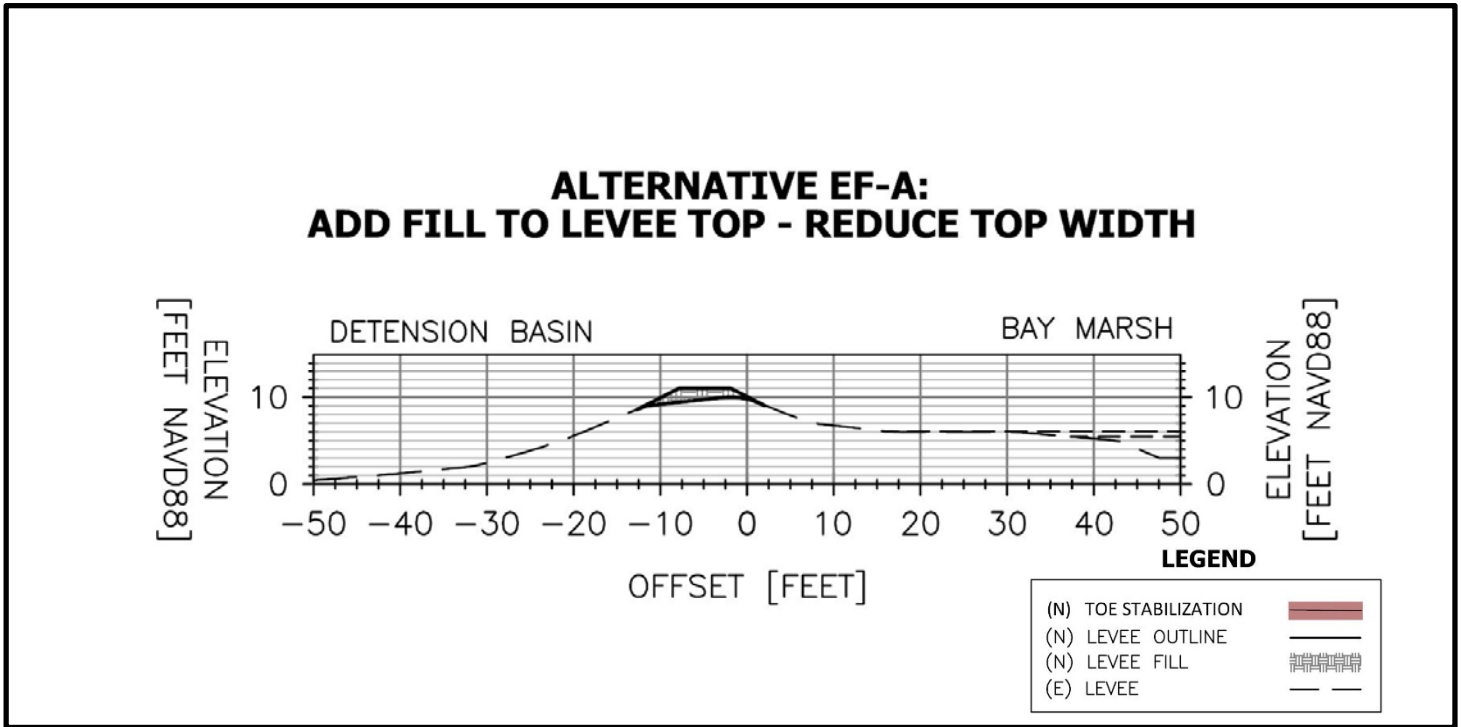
A: Typical Fill Section - Alternative EF -A (2:1 Slope, Levee crest top width varies @ 6-7 ft.)
